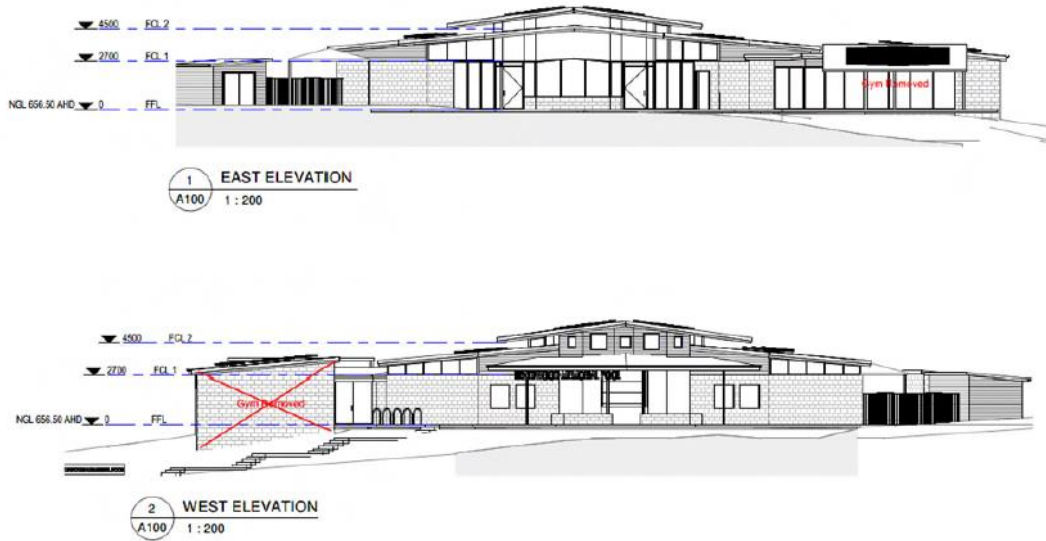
Previously Approved (under DA.2021.1258) East and West External Elevations (Prepared by Paul Barnett Design Group)
